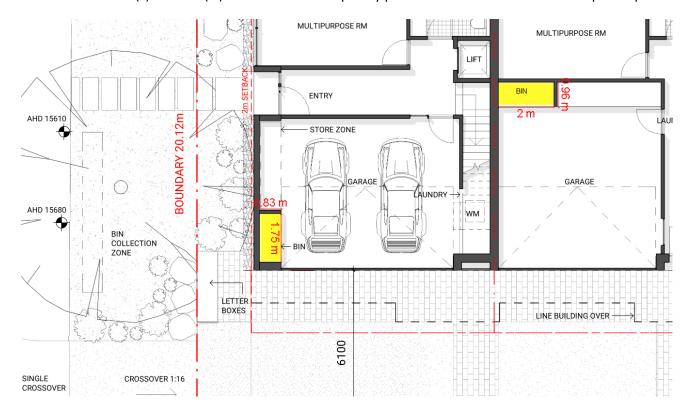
Extract of ground floor plan showing bin storage areas within the garage (highlighted yellow)
